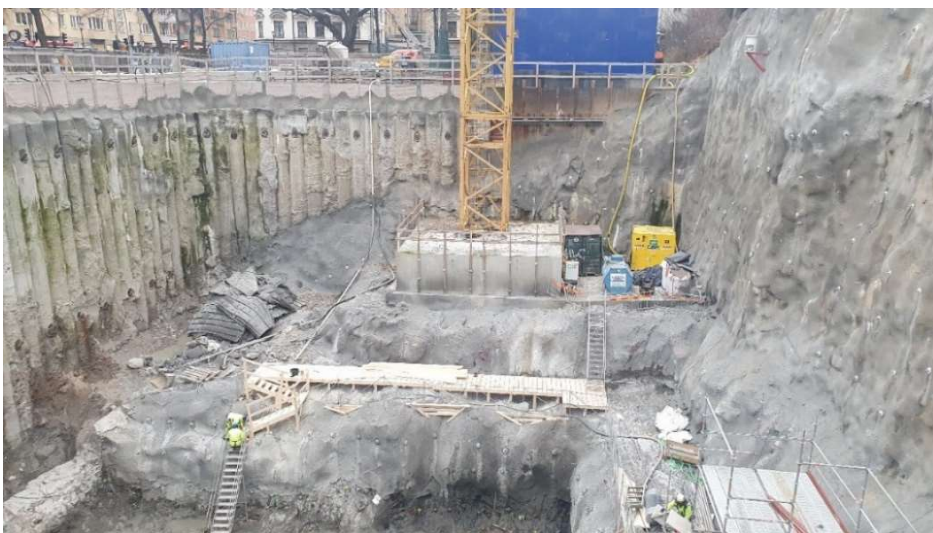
Secant pile wall, facing south and west, rock slope facing north.
